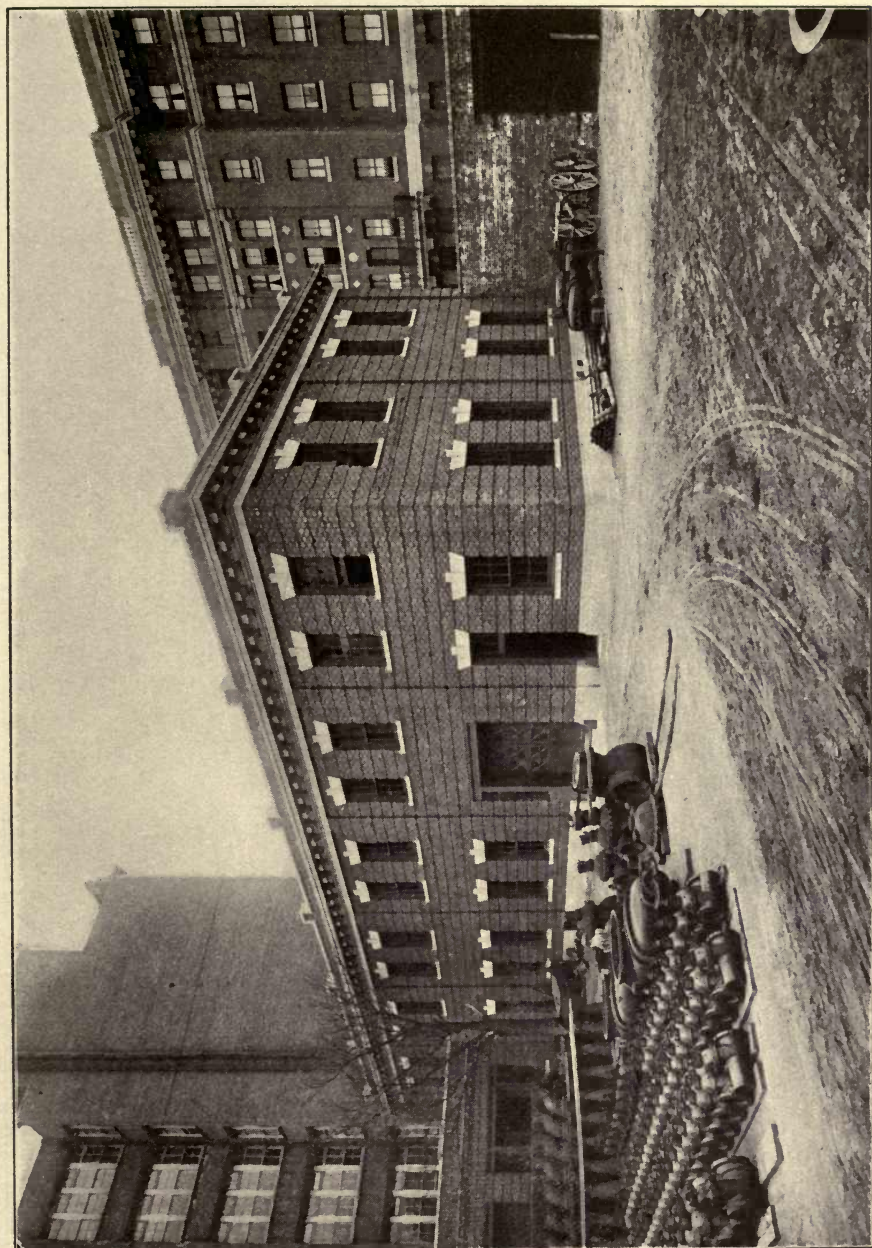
NEW STOREHOUSE—24TH STREET YARD.
